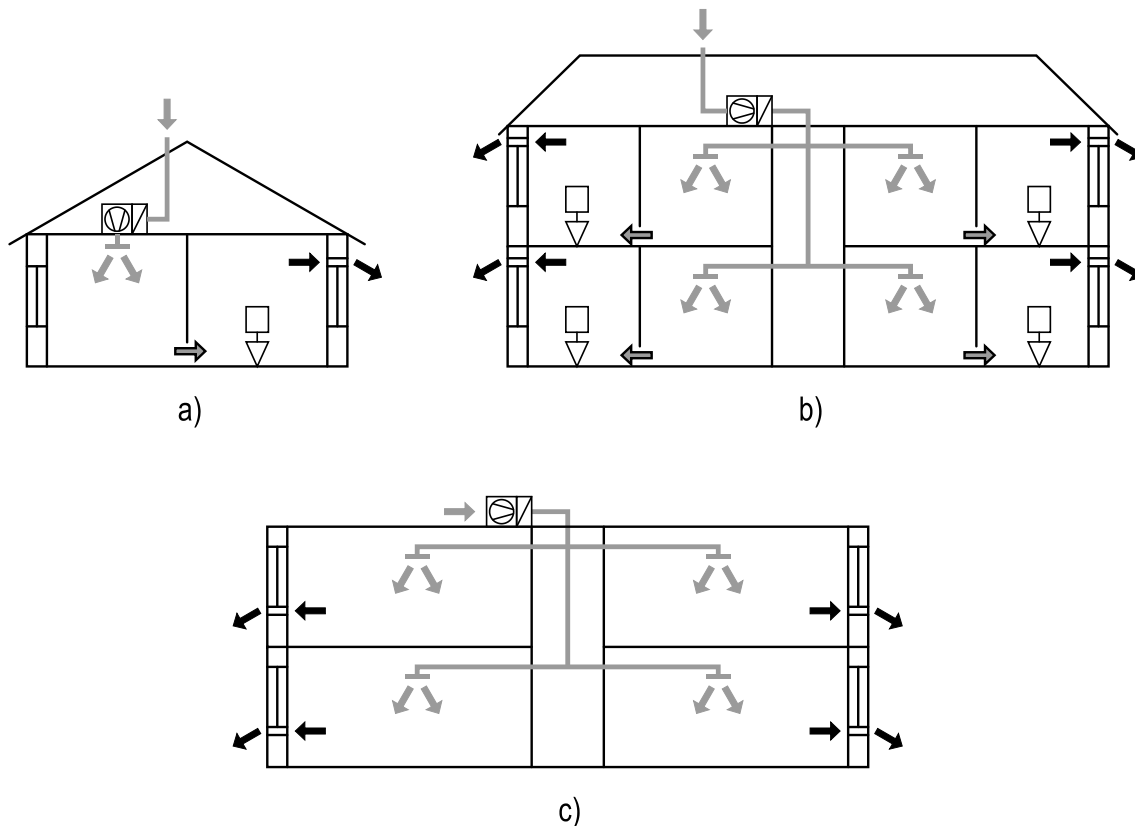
Ventilation system 3B: a) house; b) apartment building; c) office building
